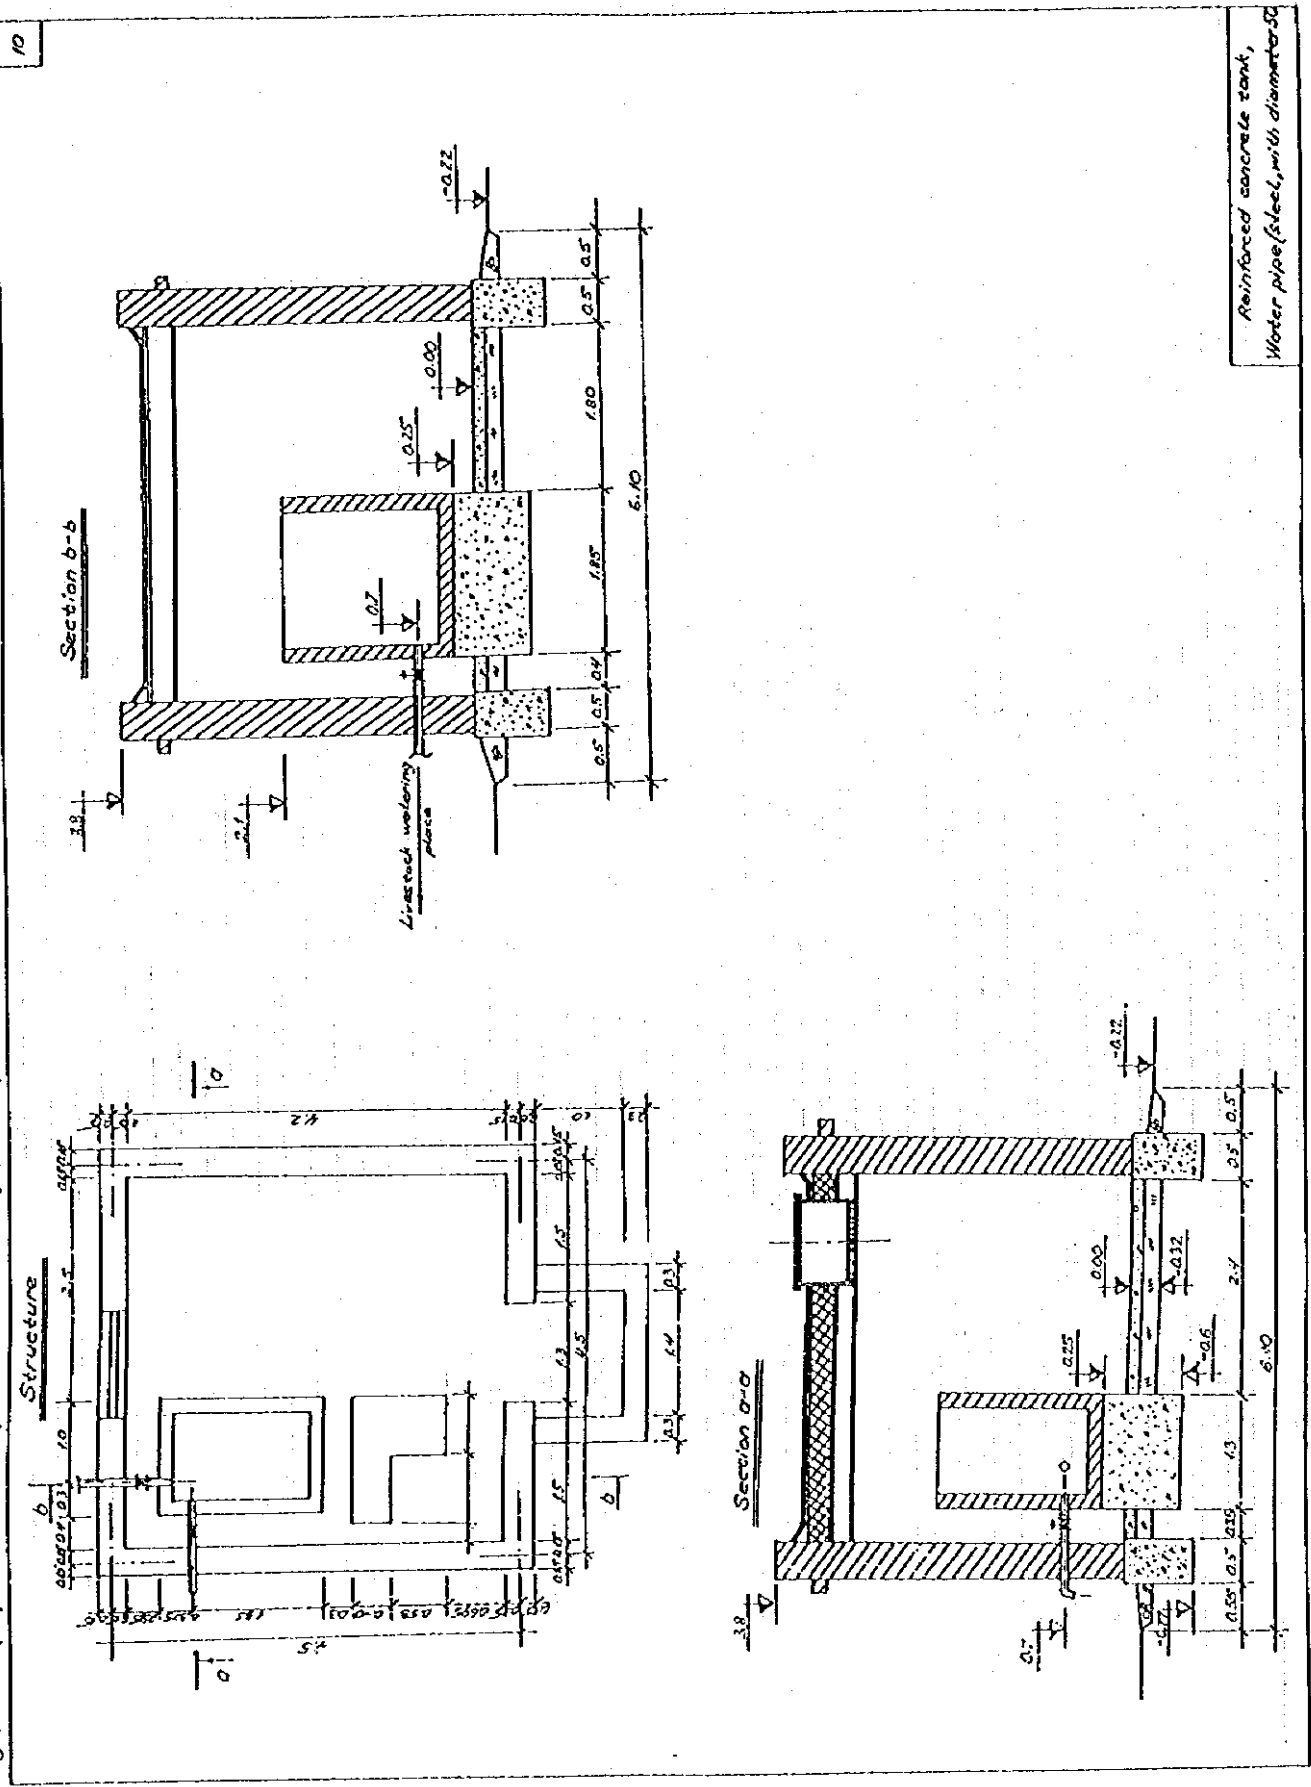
(1) Water facility wind powered pump related design drawings
